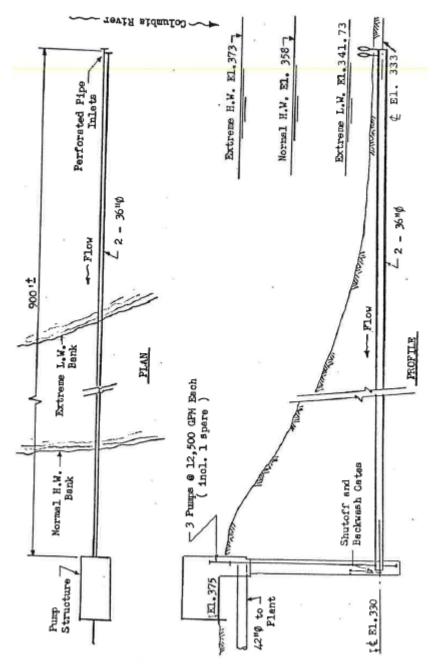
CGS Intake sytem plan and profile (Coutant 2014)
